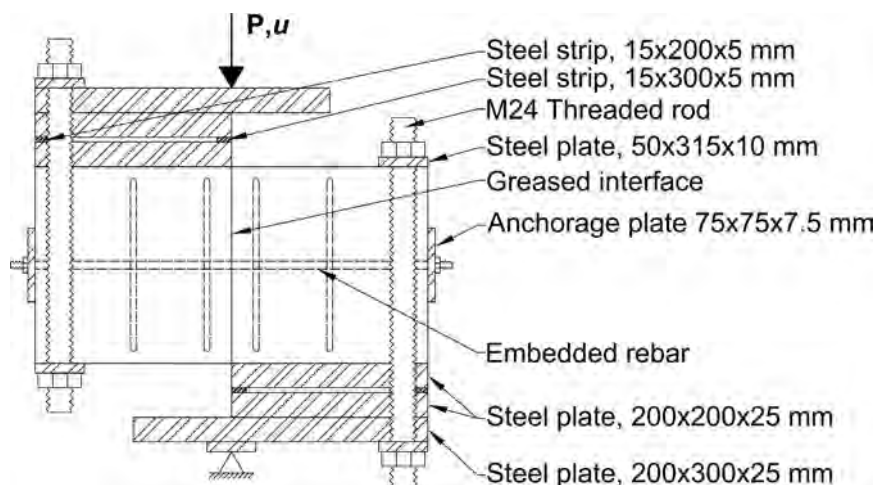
Test setup for push-off testing of casting joints crossed by rebar(s).
